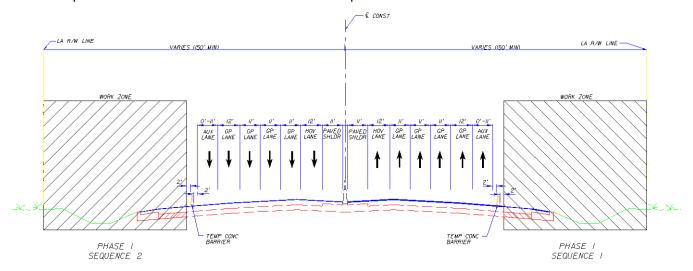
Traffic Control Plan Segments 1 and 4 from Stirling Road (SR 848) to SR 84 and from North of the Park & Ride to Oakland Park Boulevard (SR 816)
